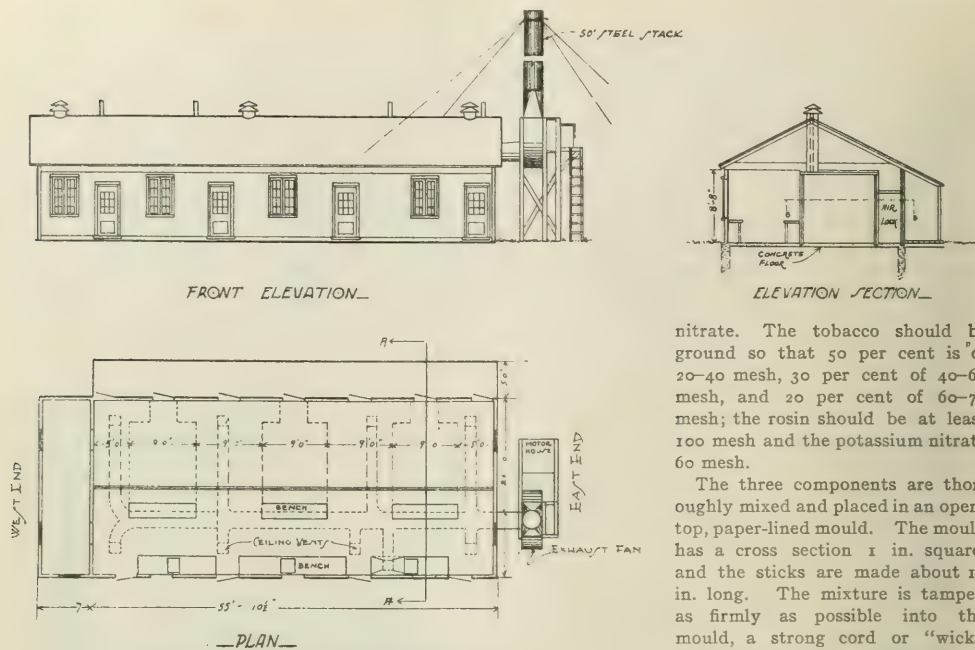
FIG. IX—ELEVATION AND PLAN OF MAN-TEST LABORATORY
